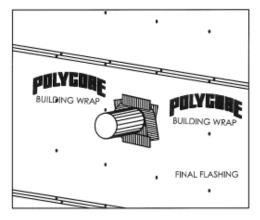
TYPICAL FLASHING DETAIL - UNFLANGED
